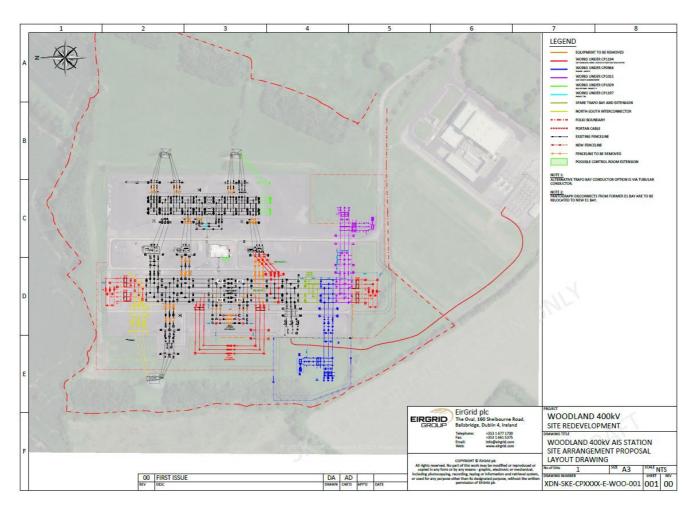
Outline of proposed arrangement at Woodland substation (reference drawing XDN-SKE-CPXXXX-E-WOO-001)
